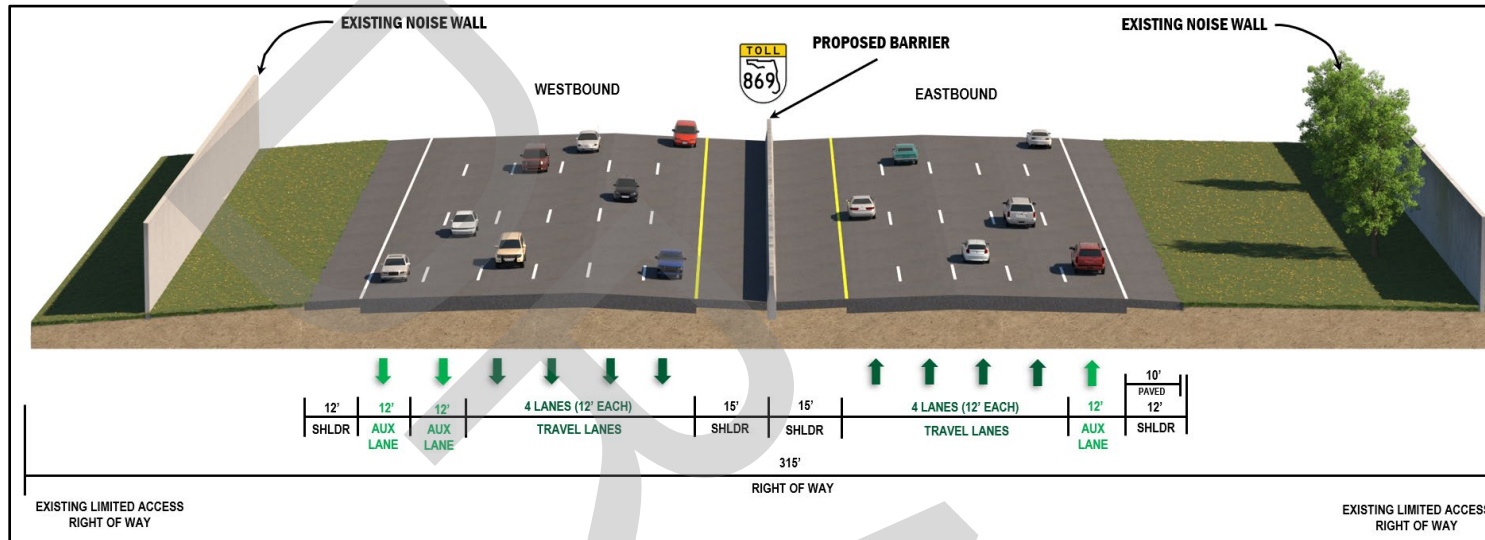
Preferred Alternative Roadway Section West of US 441
